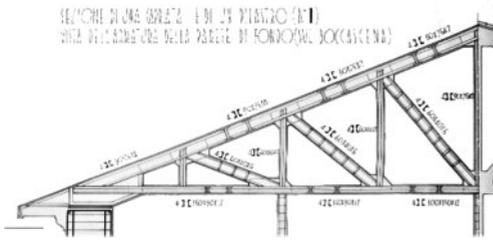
Preliminary solution with triangular trusses. Andrea Villa's private archive.
